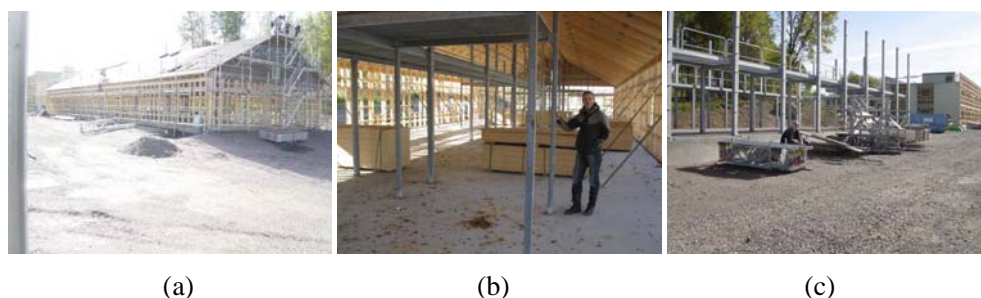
(a)-(b) are ground photos of the building with non-metallic roof in the centre of the images in Figure 16. (c) is a photo of one of the surrounding buildings under construction.
